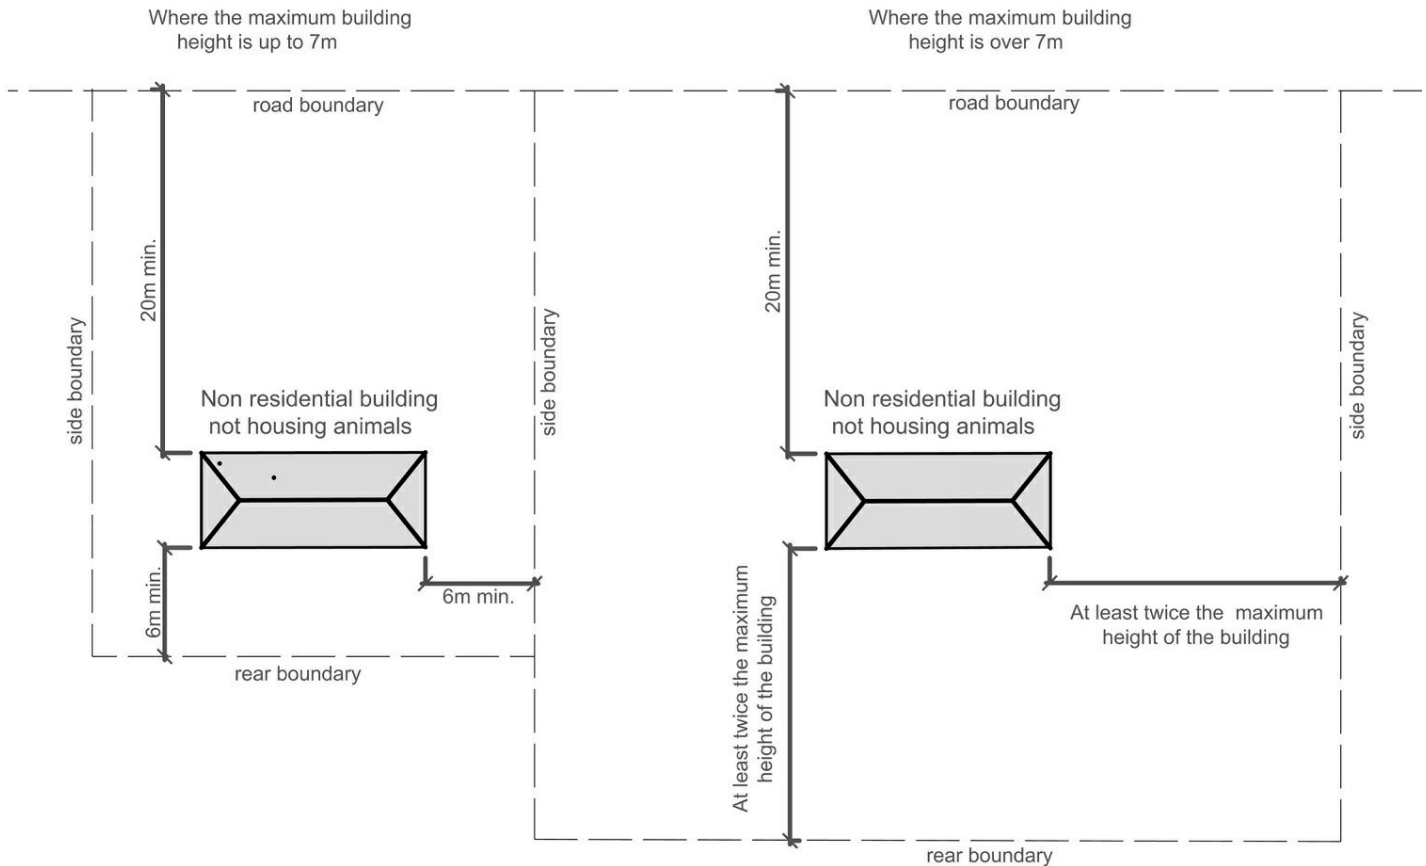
C: Setbacks for non-residential buildings not housing animals
